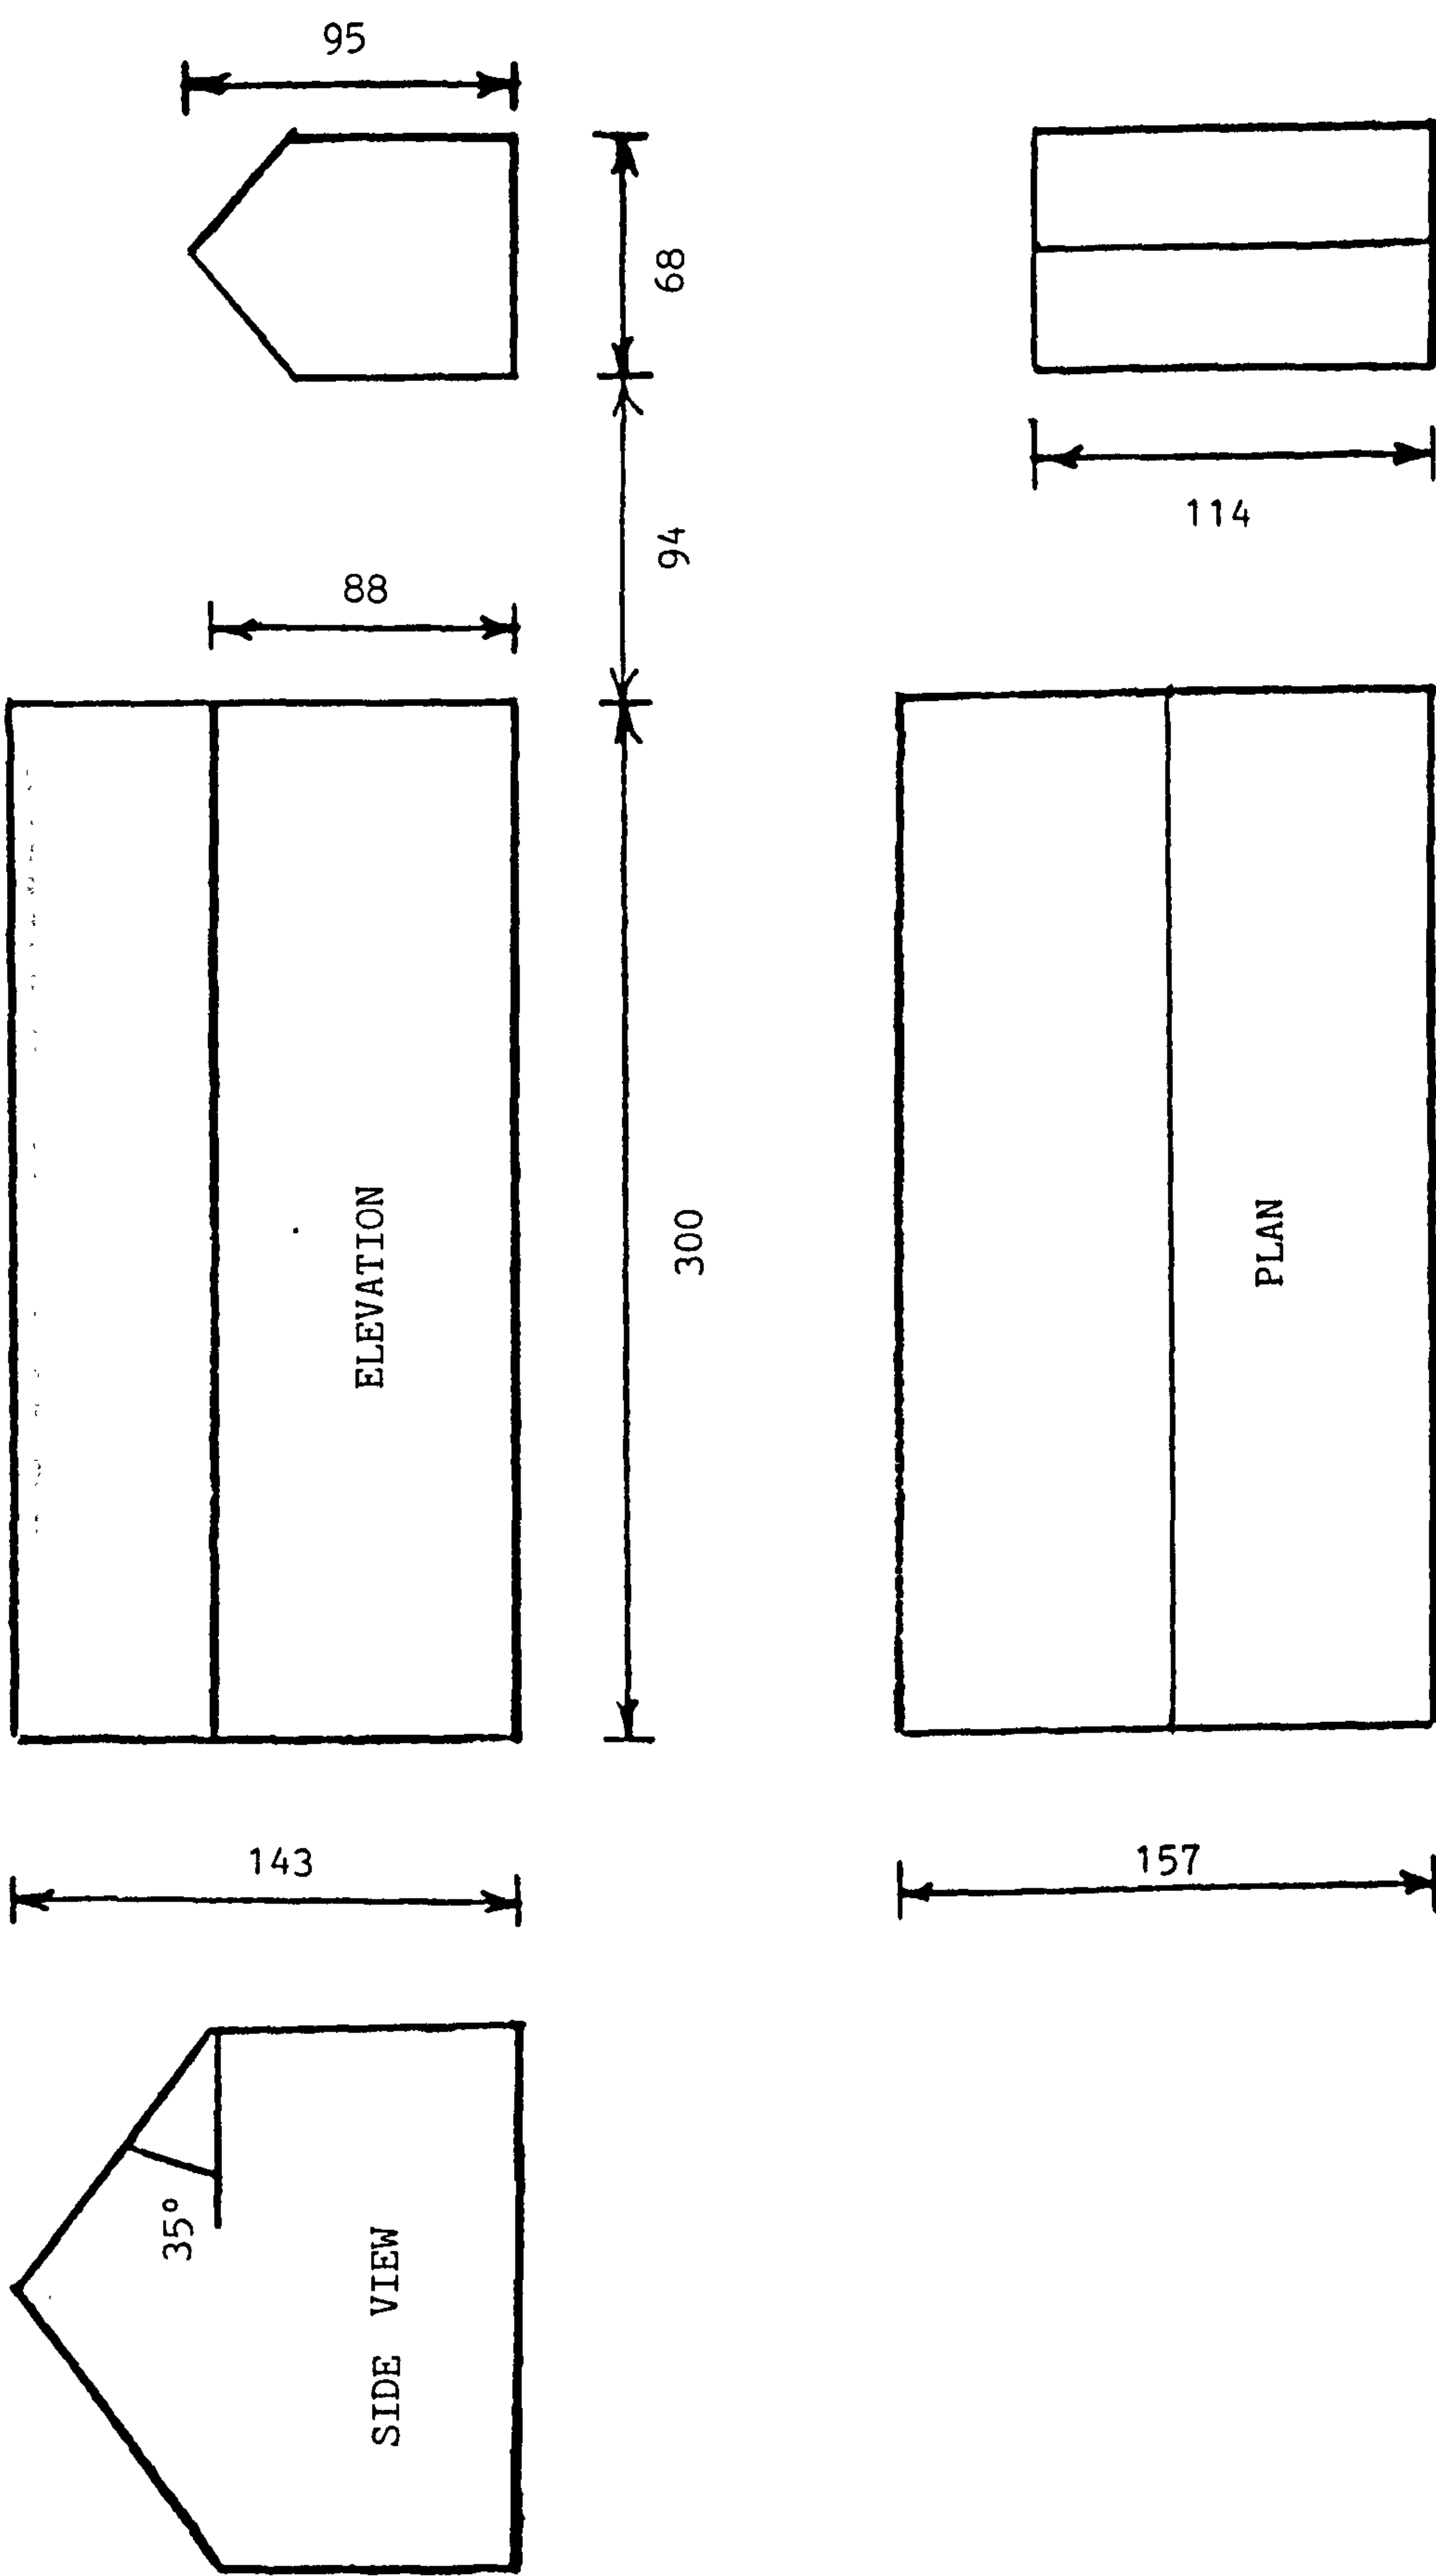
1:32 Scale model dimensions, all dimensions in mm
